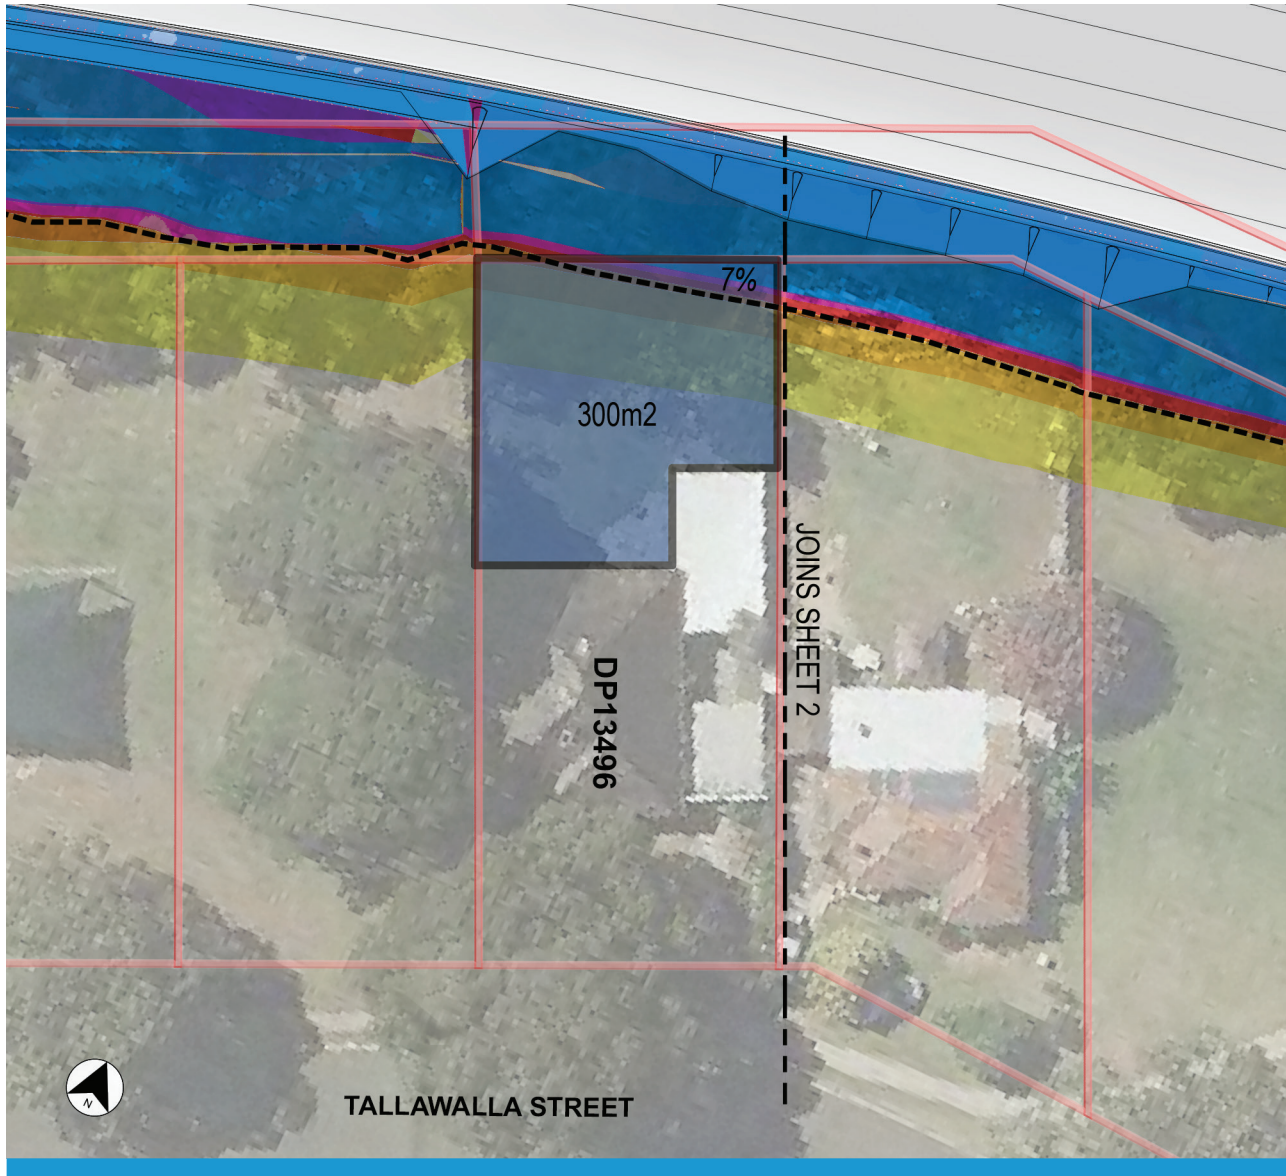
Overshadowing Assessment Plan - Tallawalla Street detail plan
